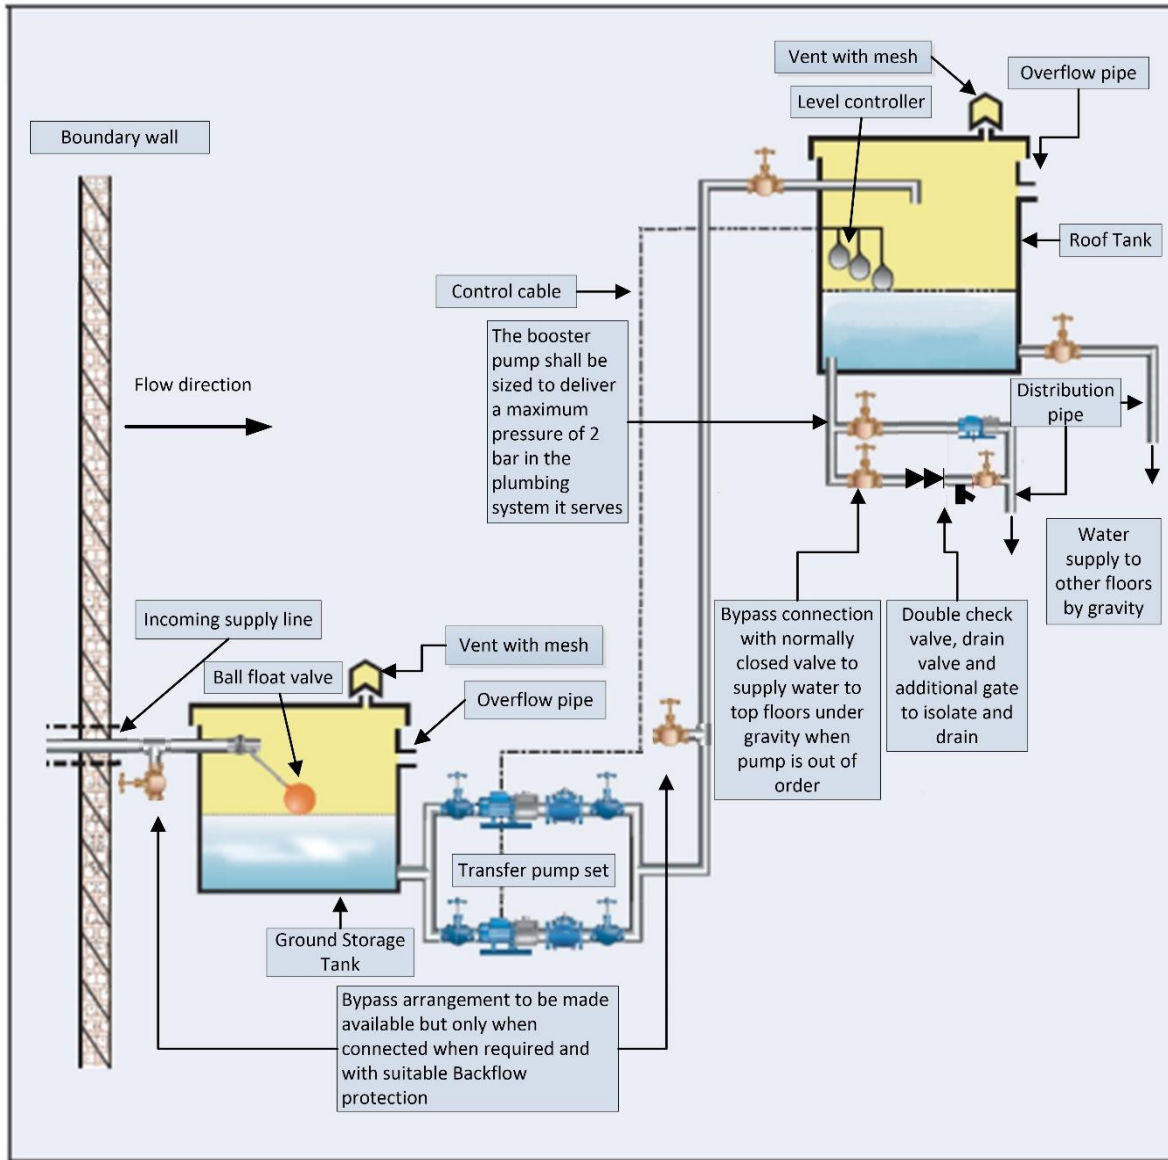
Typical connection arrangements between Ground and Roof Tanks in Low-rise and High-rise Buildings
